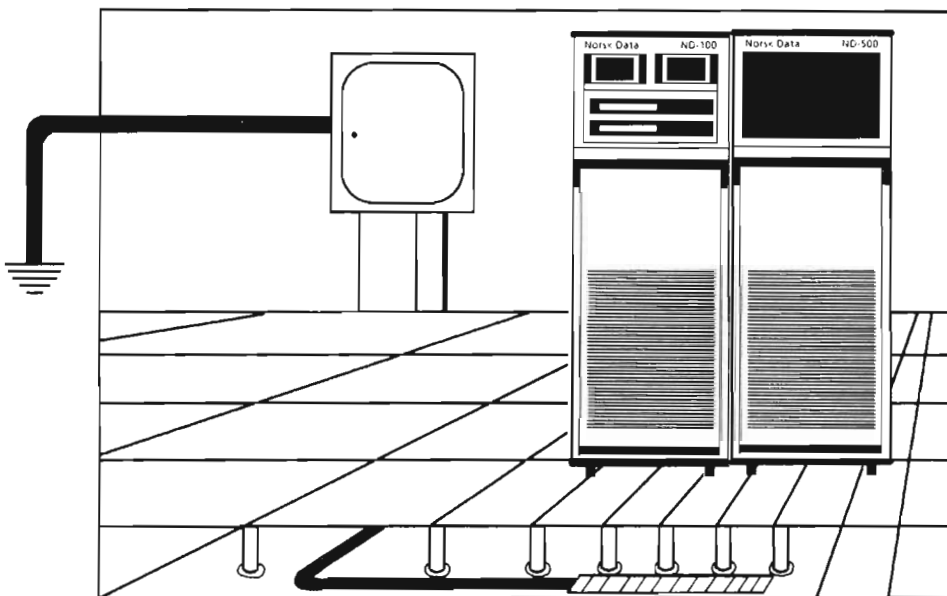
The common ground bar below the raised floor. The ground bar has a central position.
